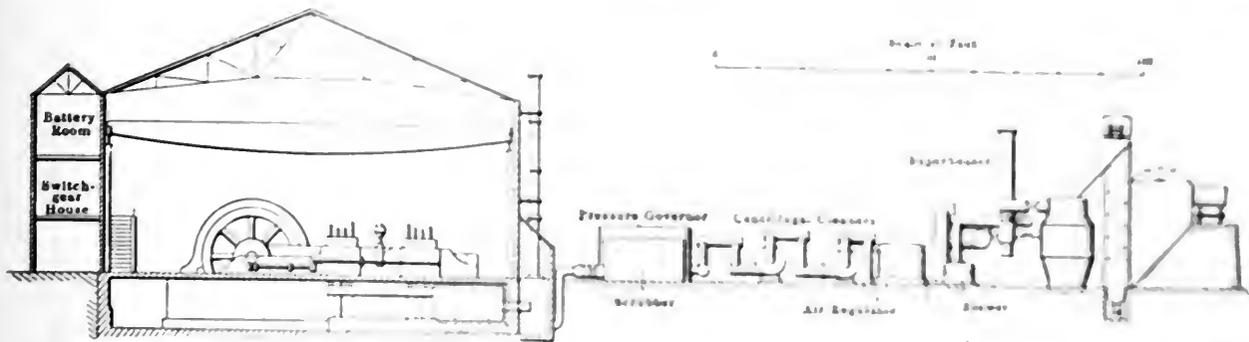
ELEVATION OF 10,000-KILOWATT GAS PLANT.
